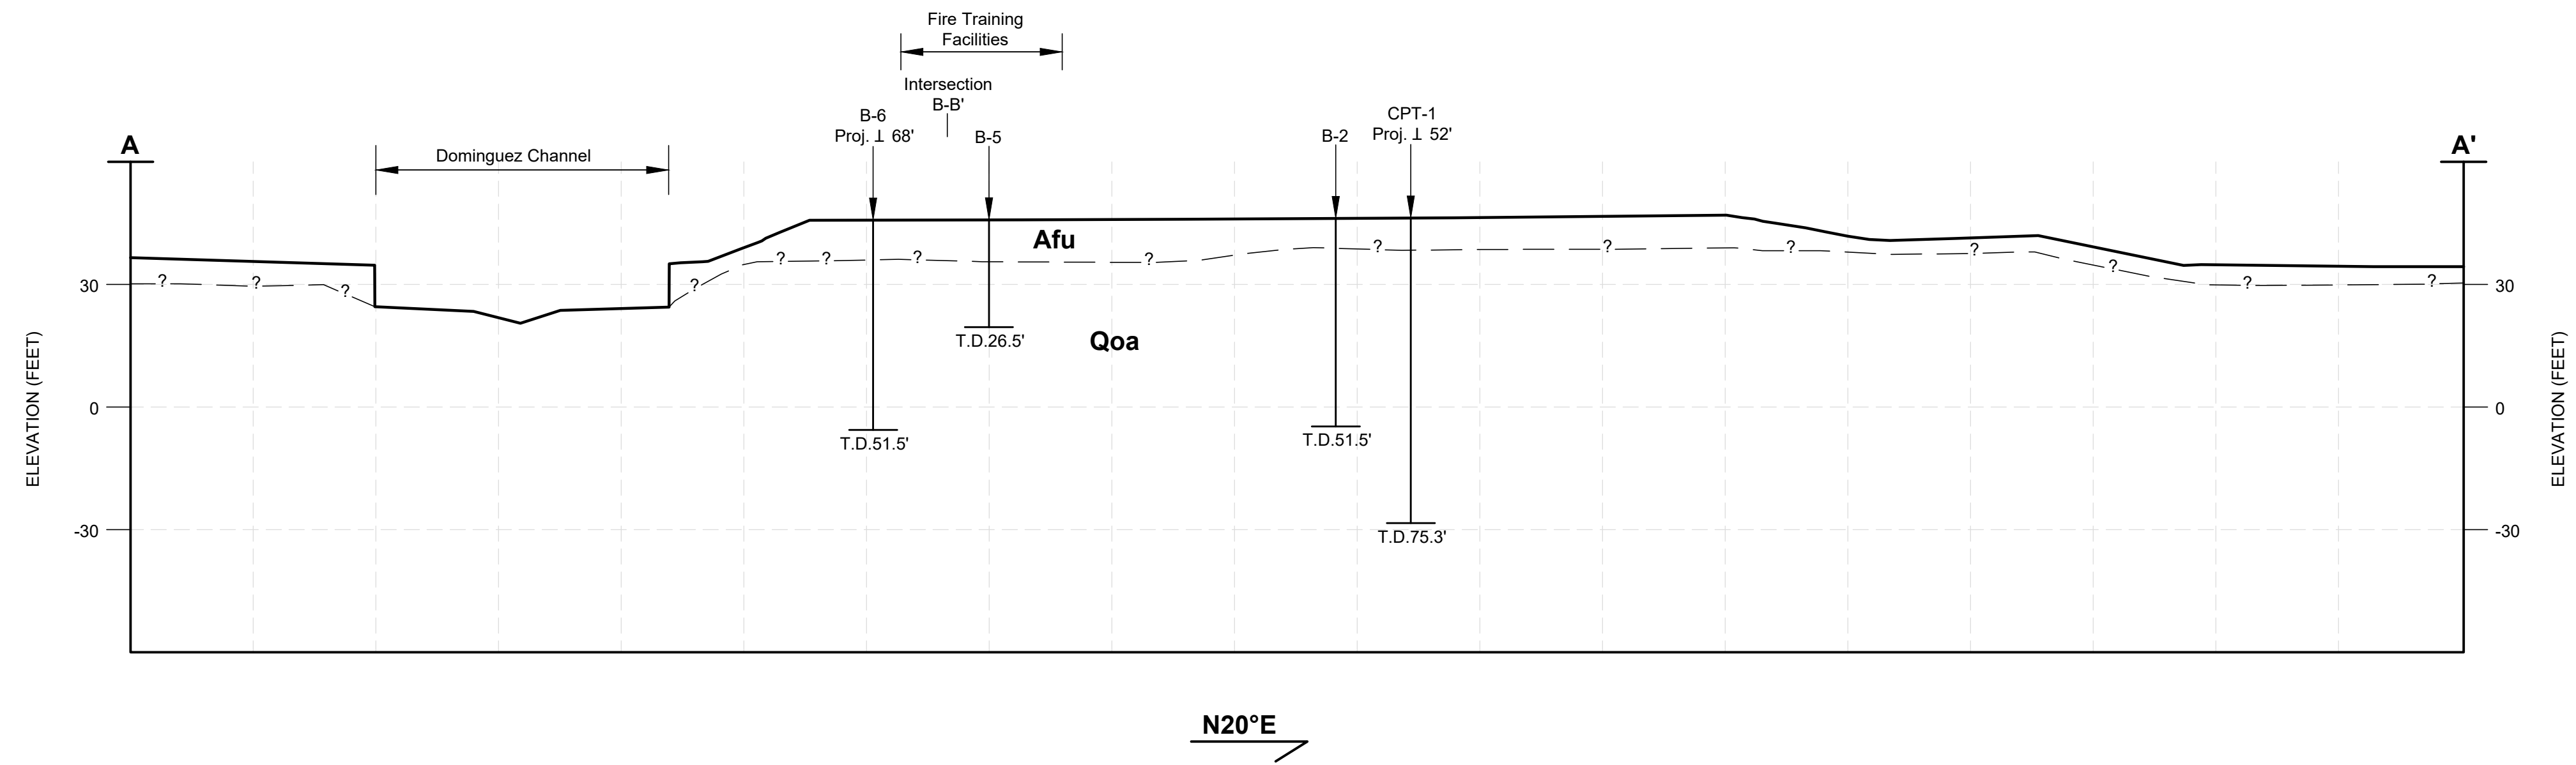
GEOTECHNICAL CROSS SECTIONS
